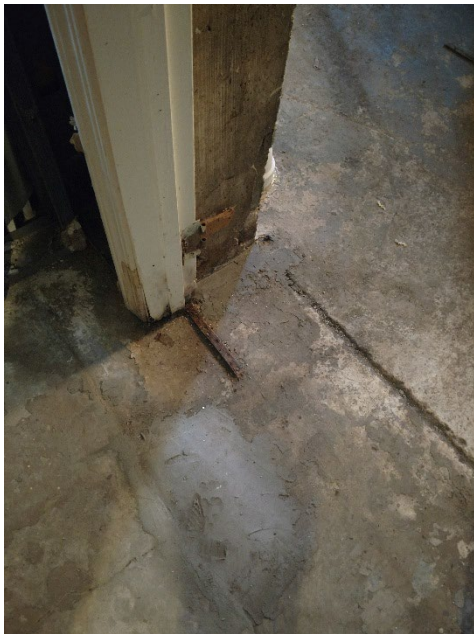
Either side of door jamb and in front of entry way filled with hydraulic cement.
